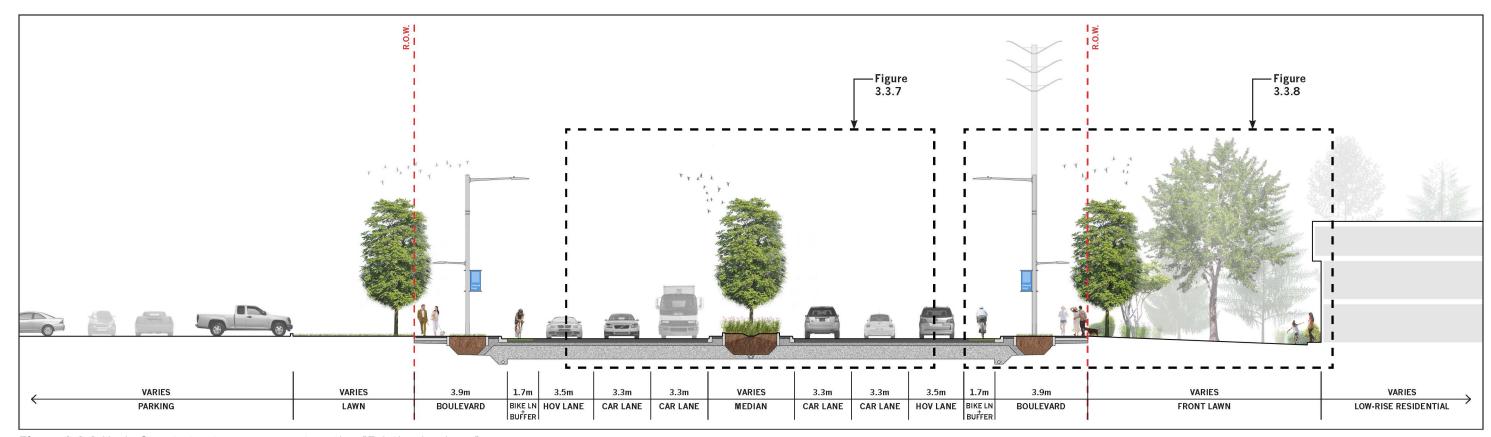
Keele Street streetscape concept section [Existing land use].
